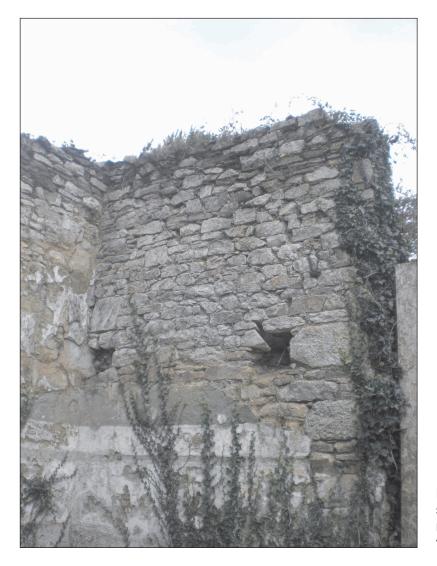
Northeast elevation showing sockets and scars in mortar associated with galleries, view from west.
